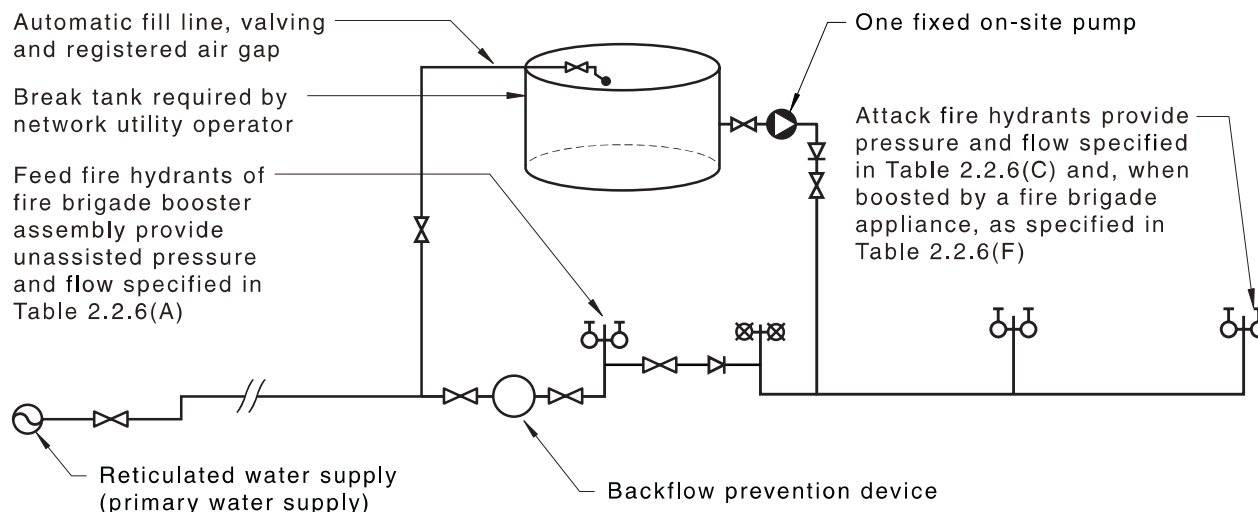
Fire brigade booster assembly installed on a full-capacity bypass around a break tank
